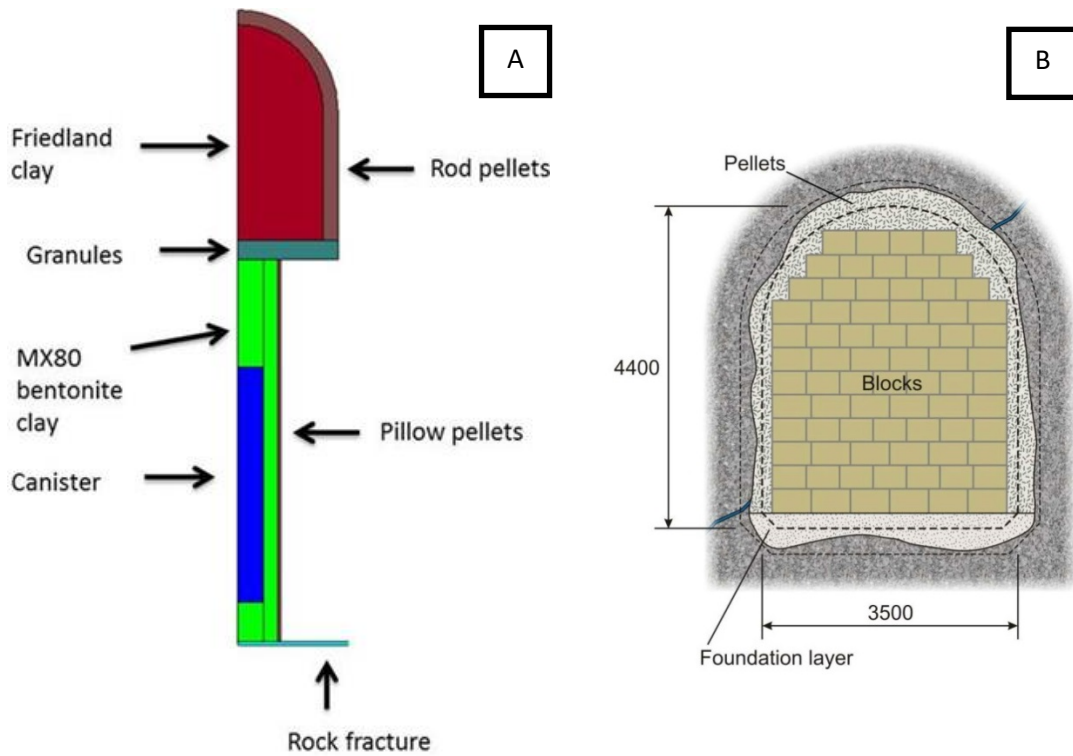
Schematic figures showing the components of the whole system (A) and detailed backfill tunnel section (B).
